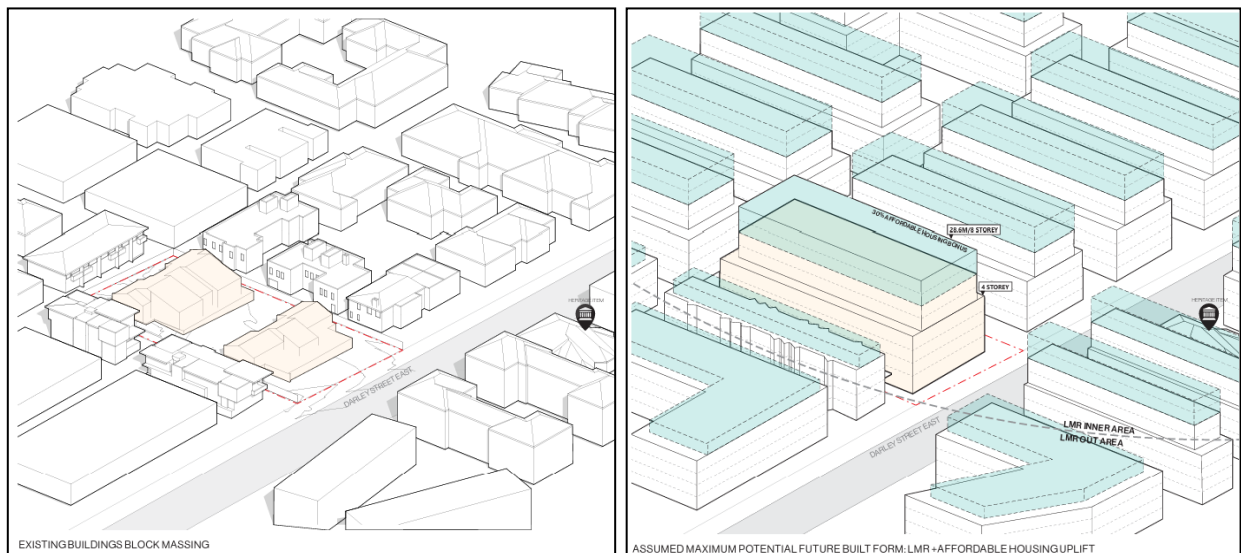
Existing built form massing (left) and assumed maximum potential built form (right) (Source: Plus Studio)
